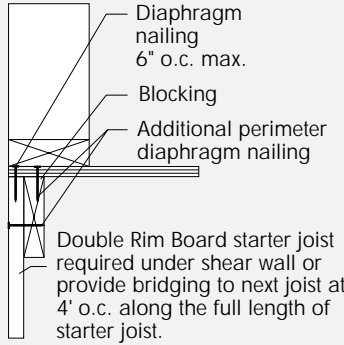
through B4 are provided to give the designer some examples of methods used to accommodate these loads. (See Appendices A, B and C for nail capacities.)
